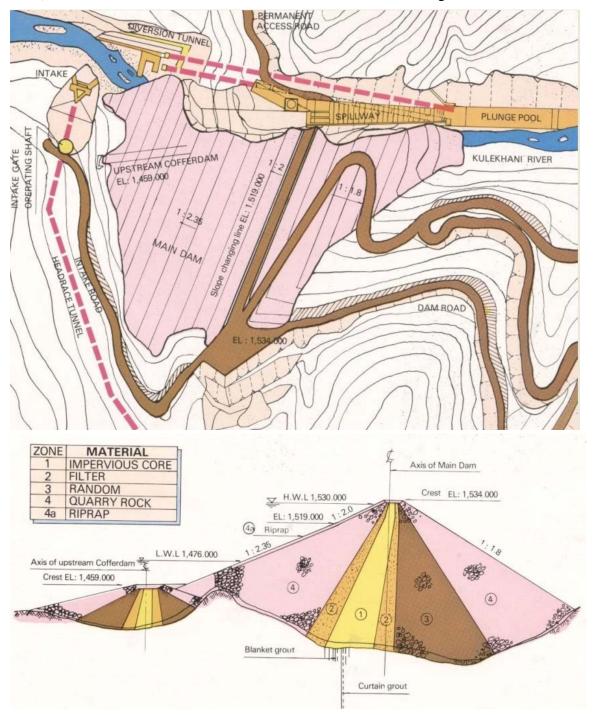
Plan and Cross section of Kulekhani Dam (Source: Sangroula, 2005)
